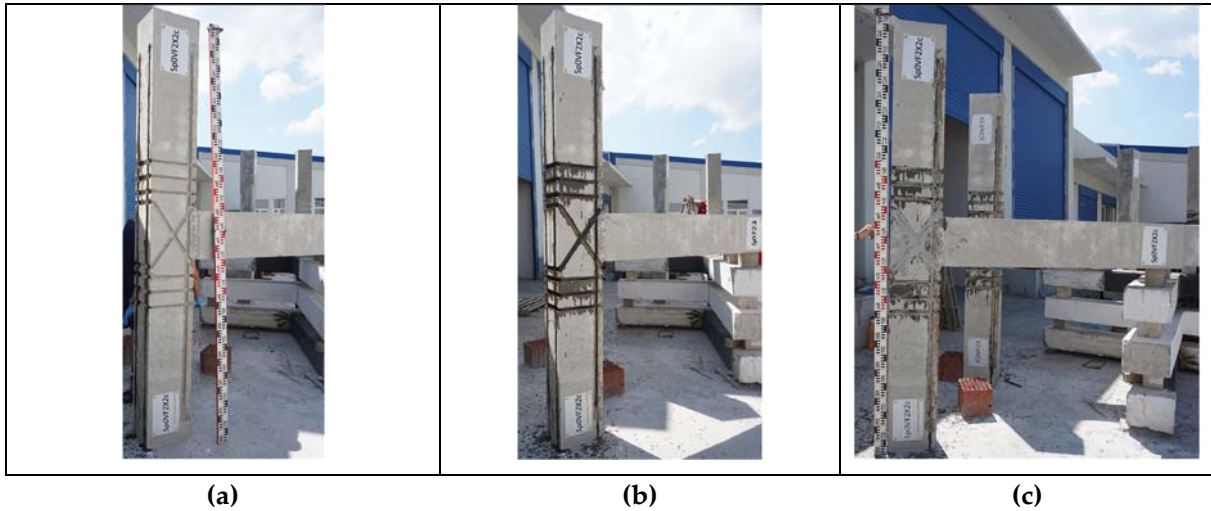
Real scale specimens. Notches (a) and placement of the ropes - strengthening of the joint area and column (b, c)
